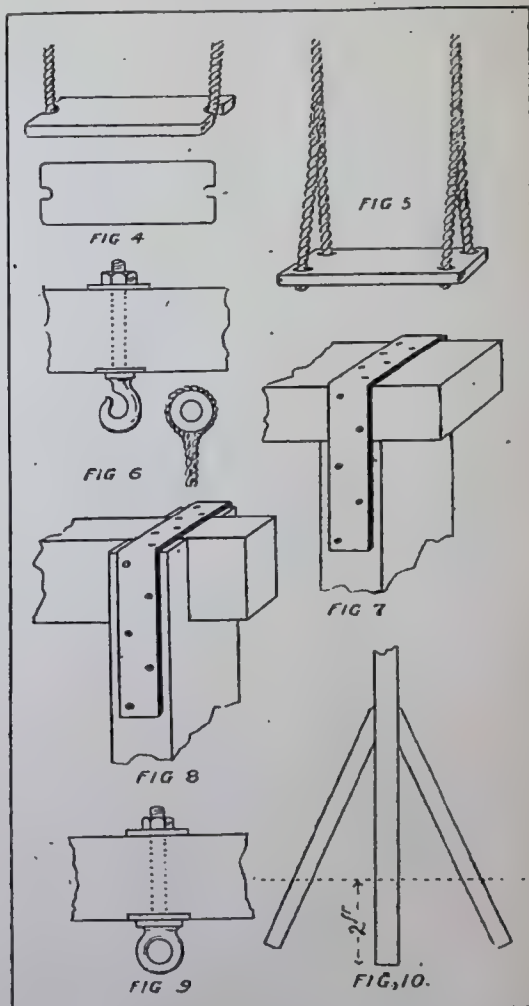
THE SEAT. FIG. 5.—ALTERNATIVE SEAT. FIG. 6.—HOOK AND BOLT. FIG. 7.—IRON STRAP TO BIND TOP BAR TO POST. FIG. 8.—ALTERNATIVE METHOD OF FIXING TOP BAR. FIG. 9.—ALTERNATIVE EYE BOLT. FIG. 10.—SHOWING POST AND BRACES WITHOUT BOTTOM BOARD.
